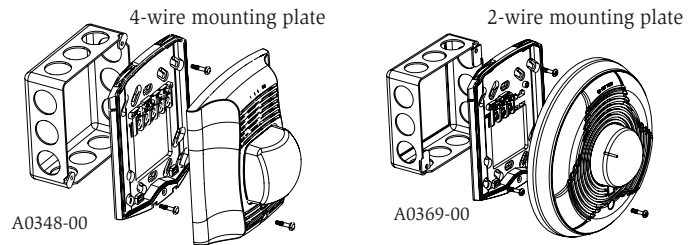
SURFACE MOUNT BACK BOX MOUNTING
